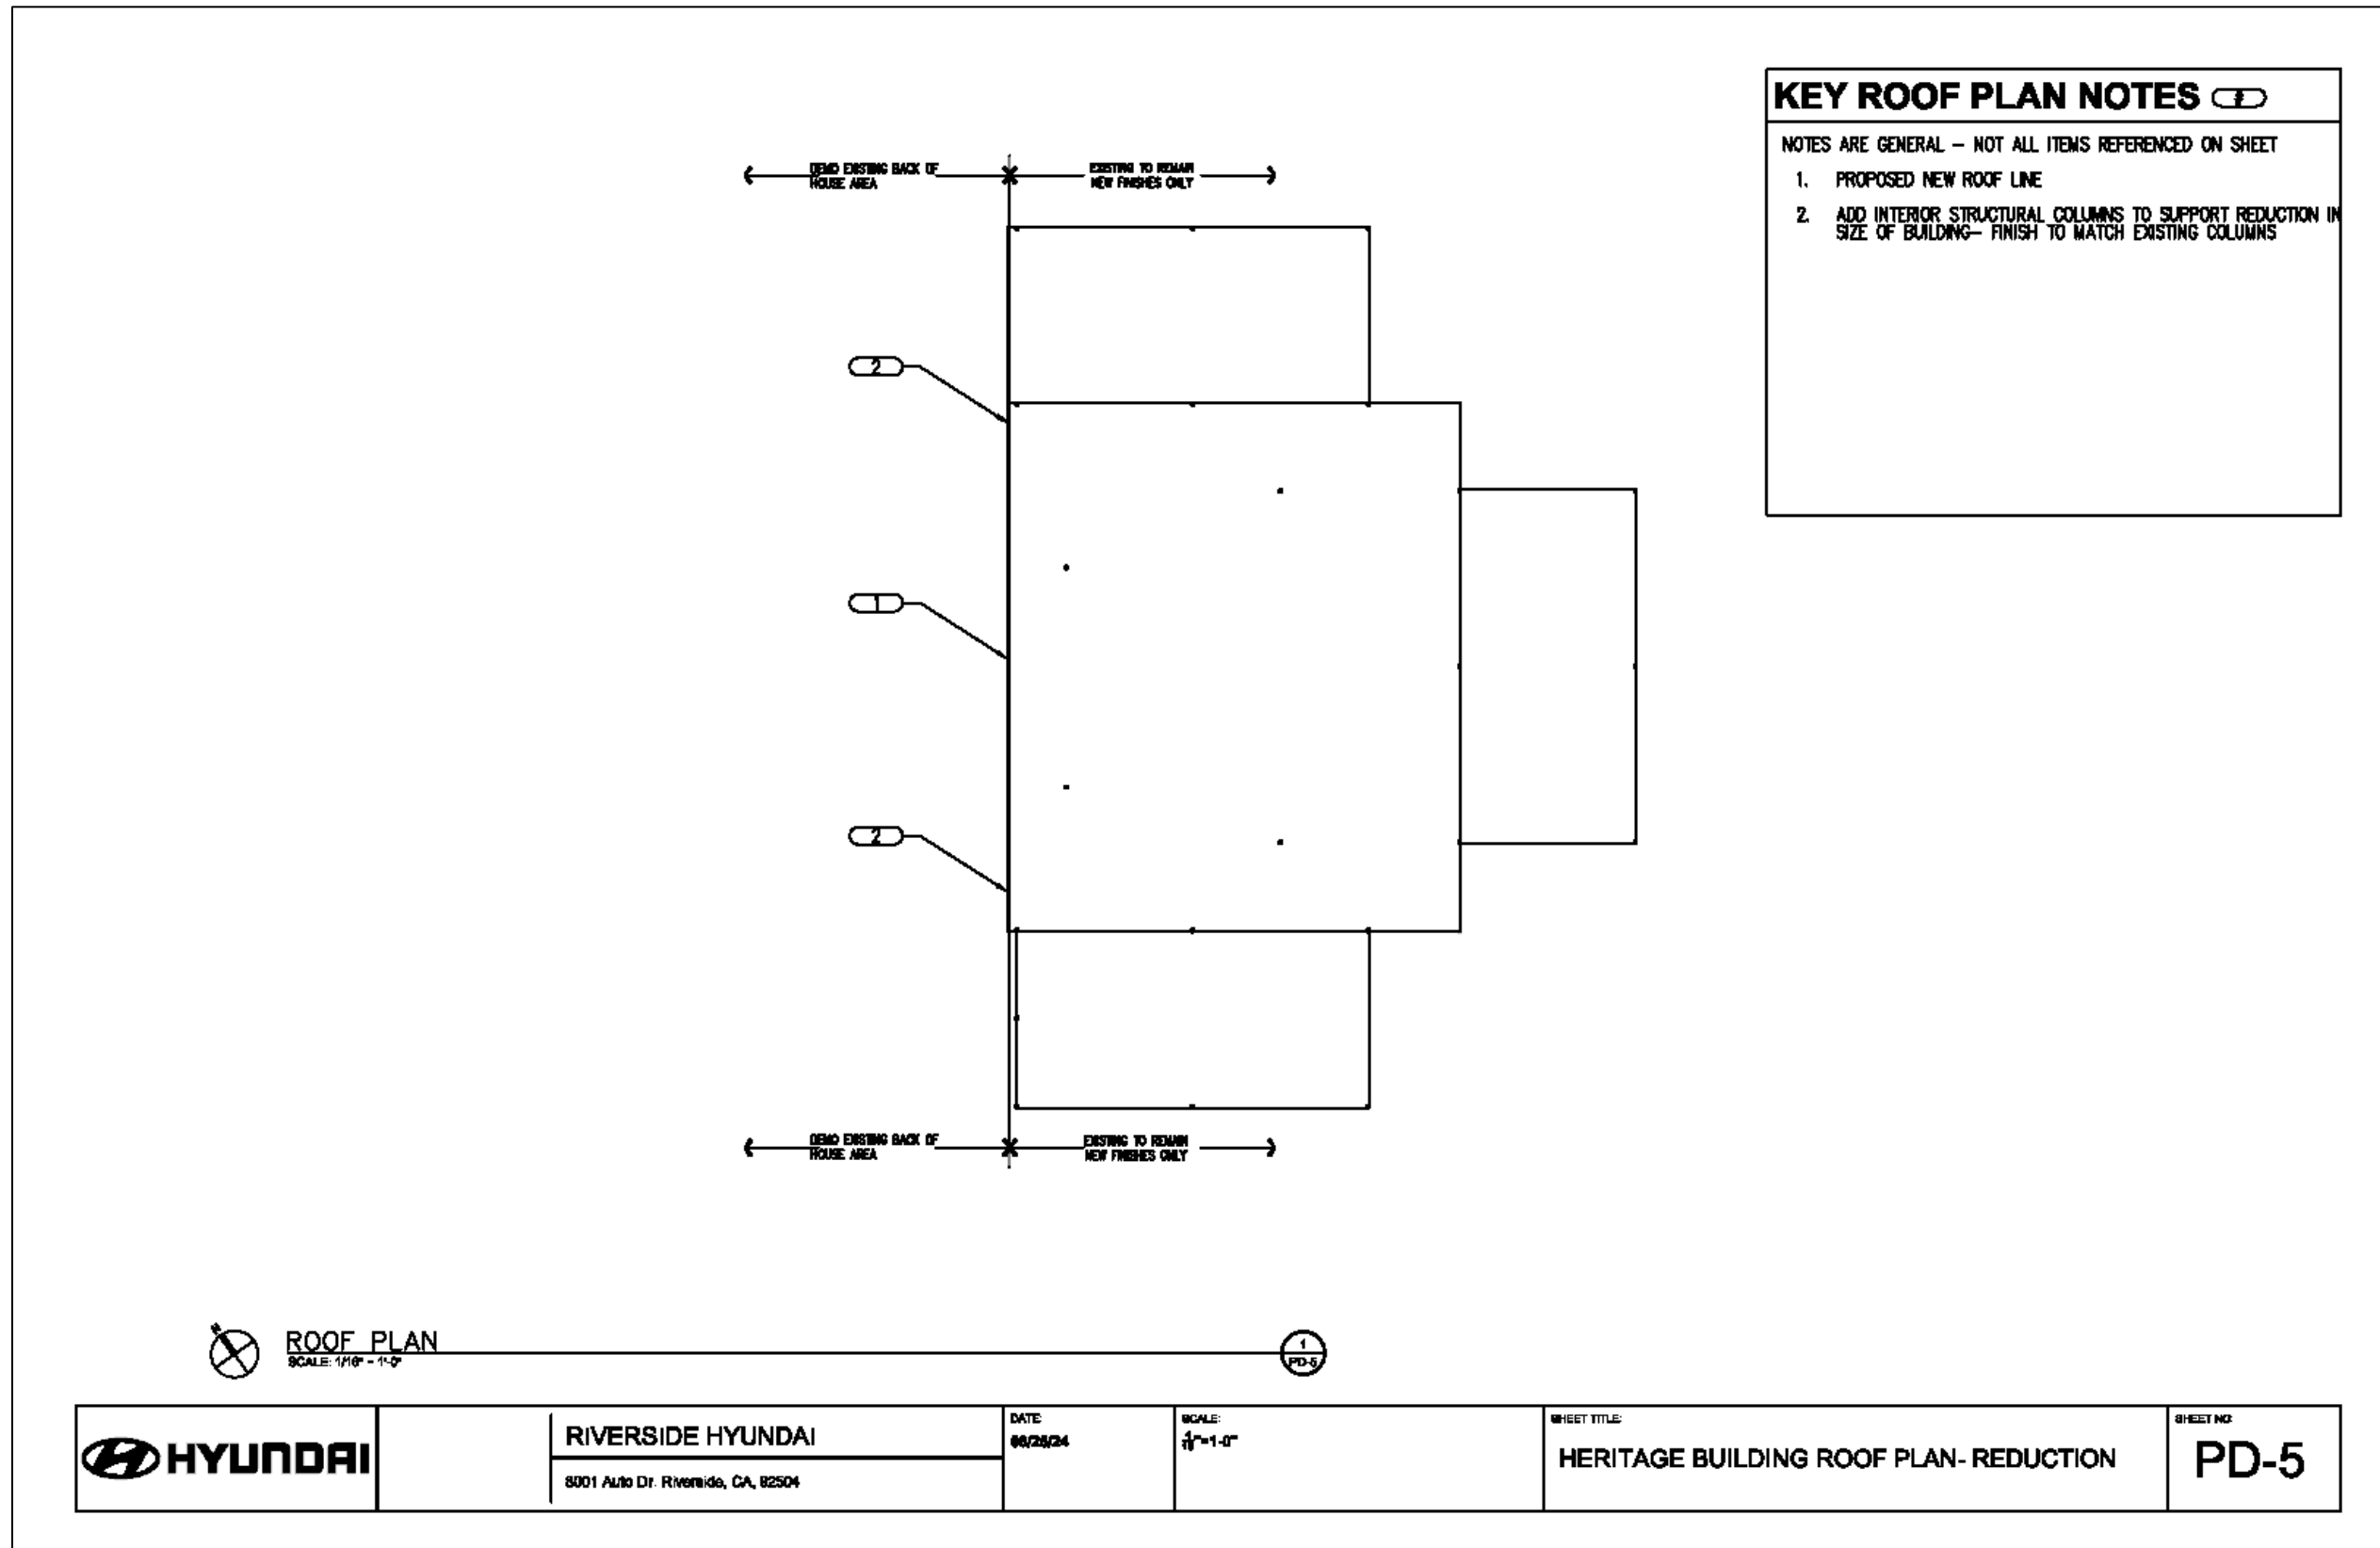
Floor plan of the proposed Project (Provided by Mike Khoury).
